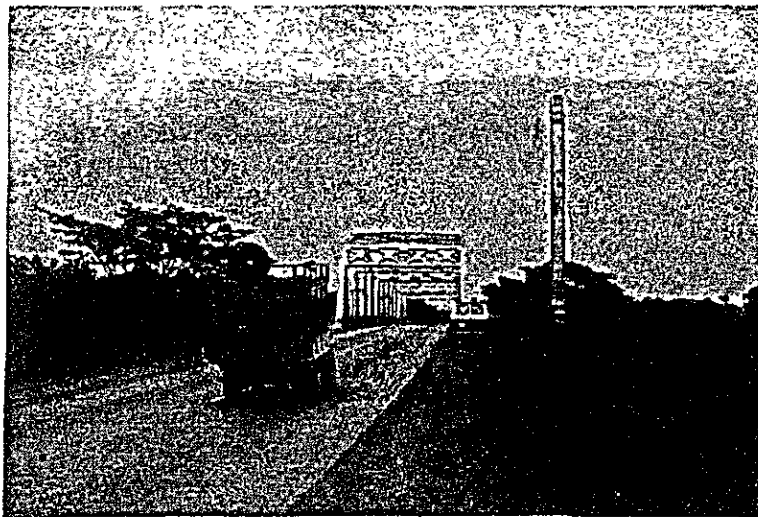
Pan American Highway near Santa Maria Bridge
